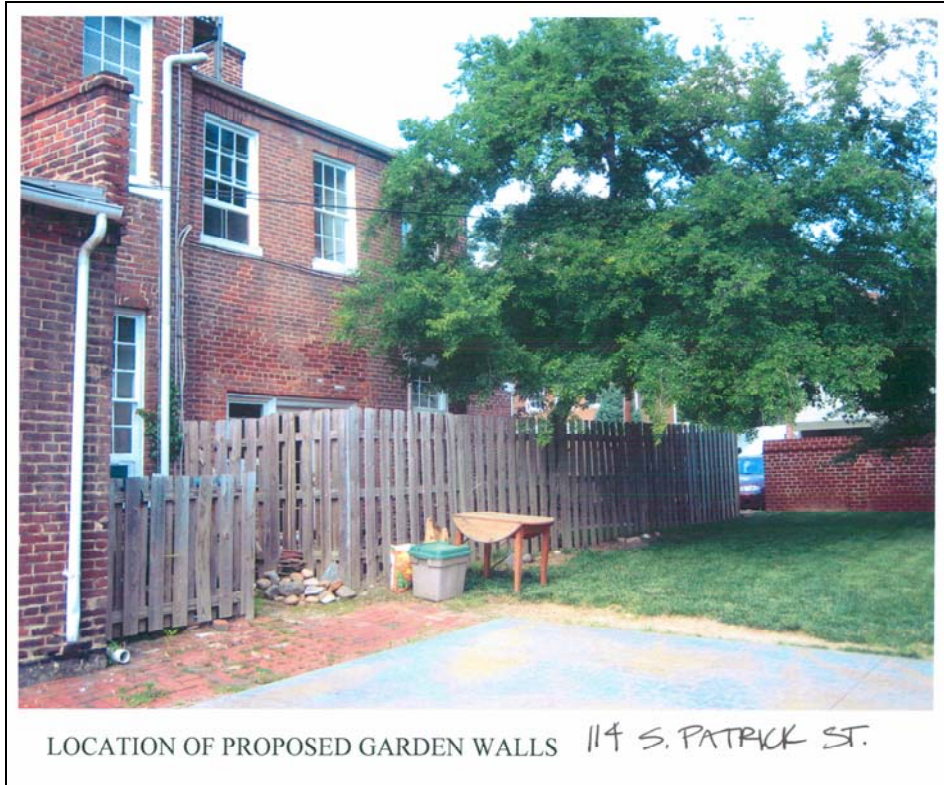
Photograph of existing conditions at 114 South Patrick Street.
